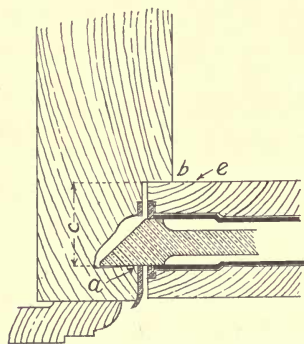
PLACING THE STRIKER OR LATCH PLATE.
